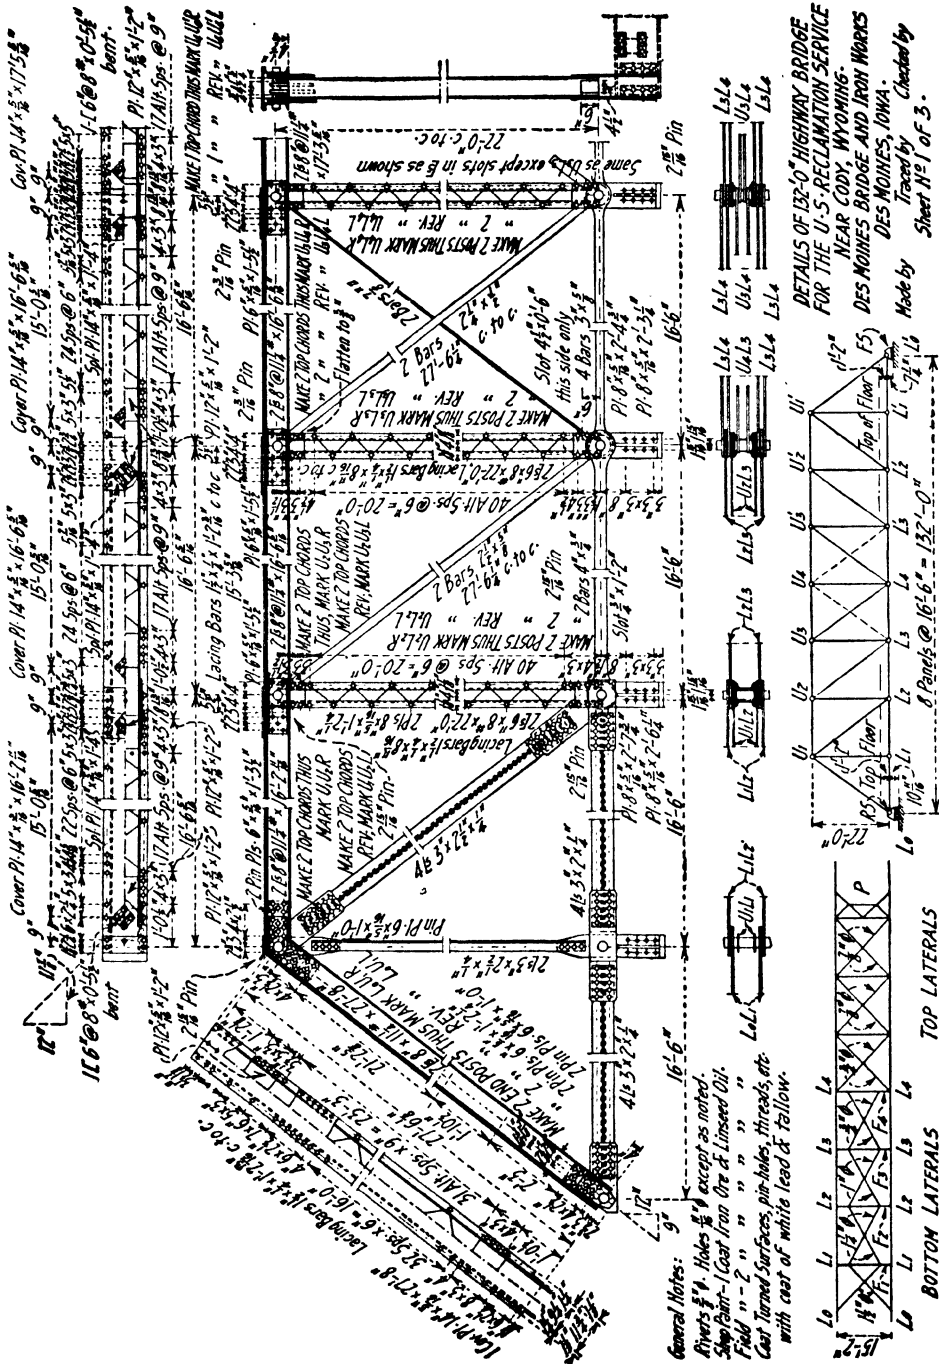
DETAILS OF A PIN-CONNECTED HIGHWAY BRIDGE.
